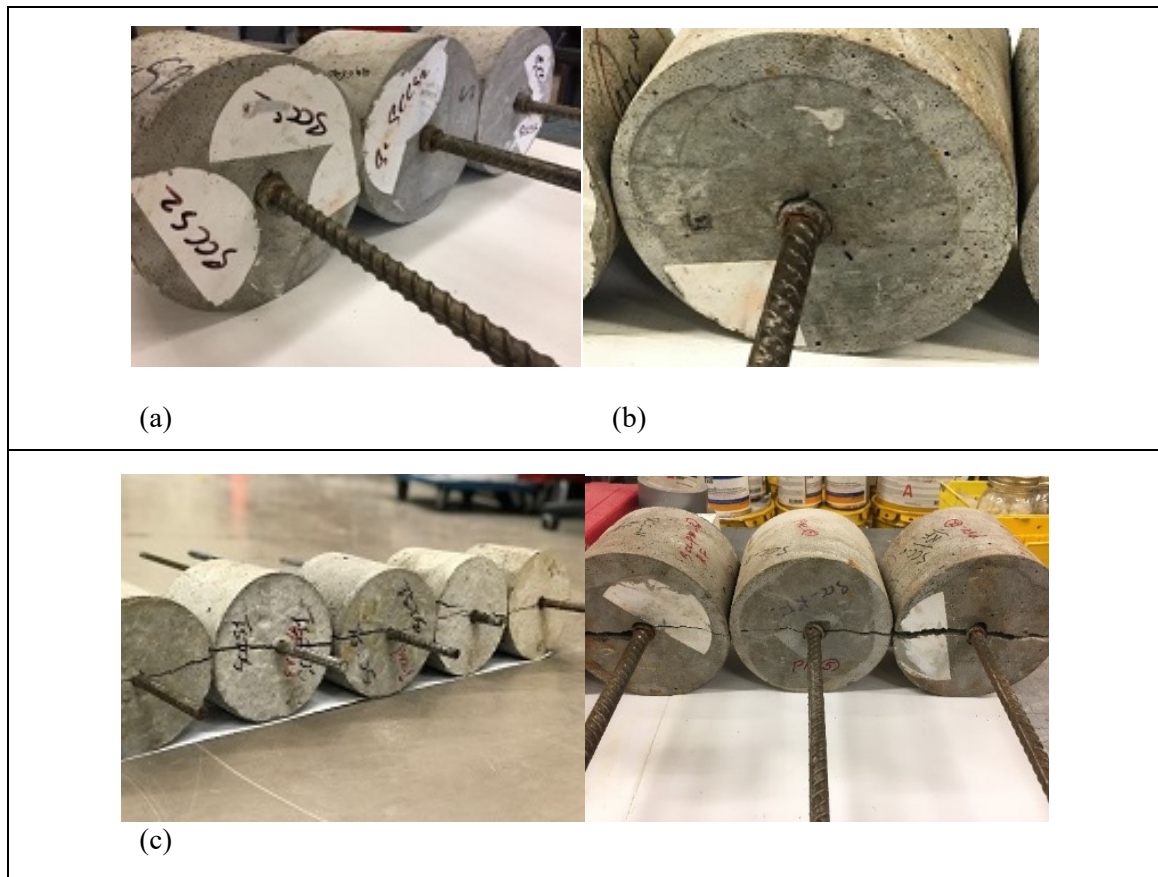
Failure modes of SCC specimens: (a) pull-out in uncracked concrete;
